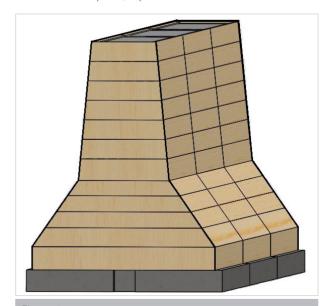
An Renewable Hybrid Barrier in New Jersey Barrier Type
